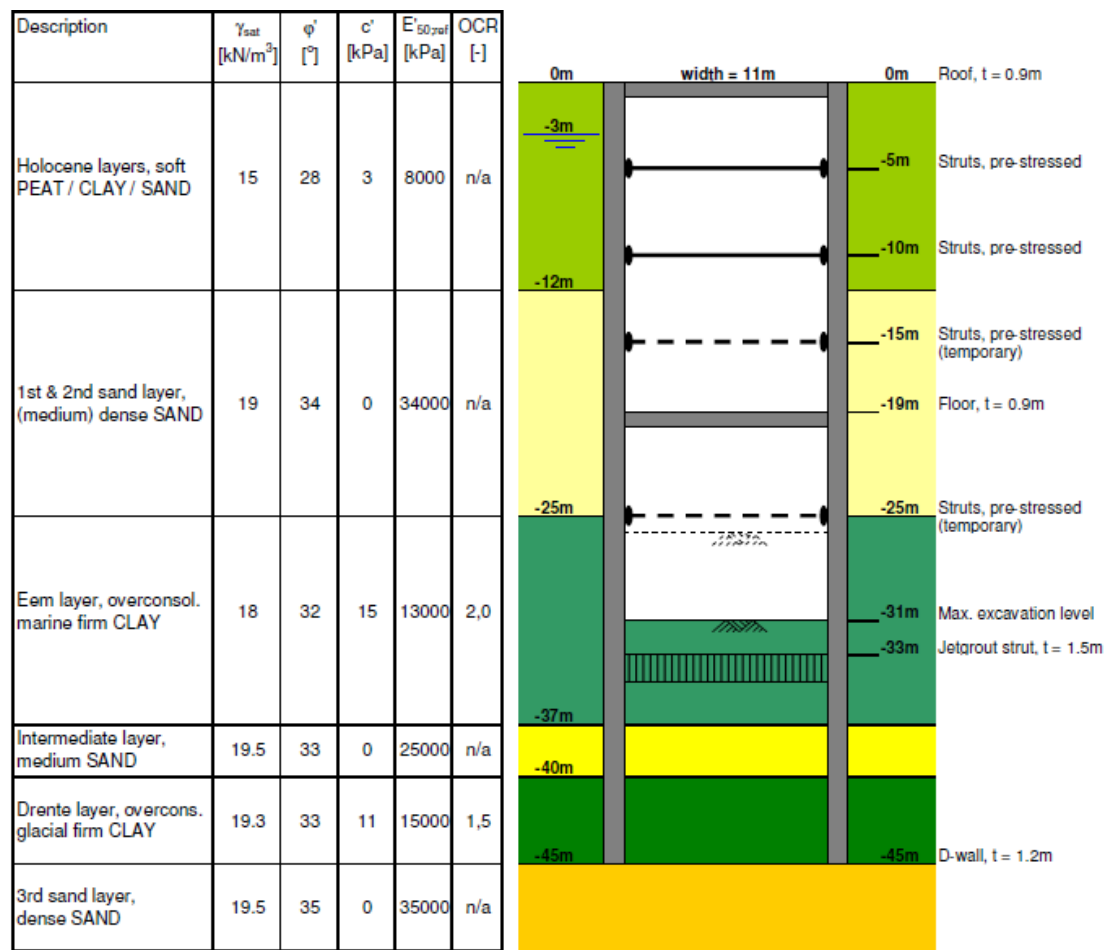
Geological profile and layout of Ceintuurbaan station in Amsterdam (Buykx et al, 2009)
